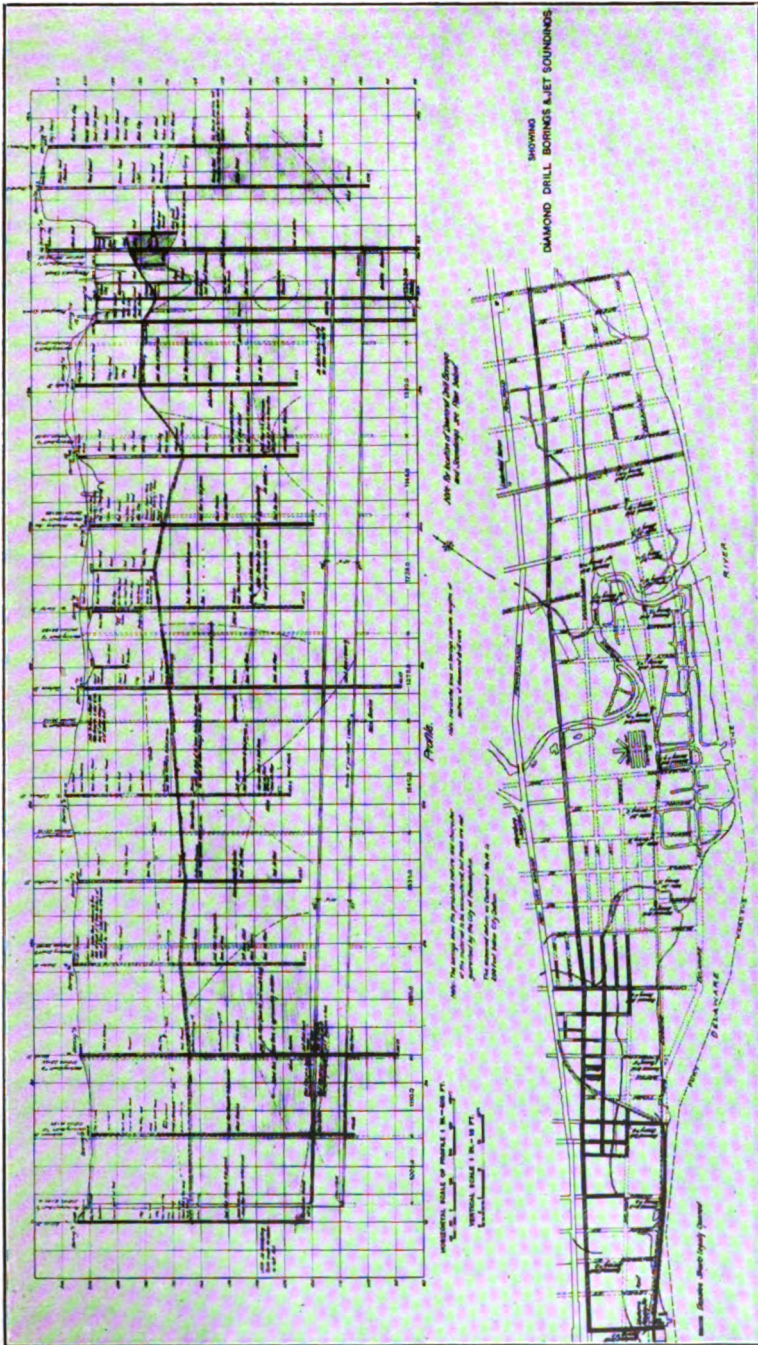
TORRESDALE CONDUIT—PLAN AND PROFILE.
